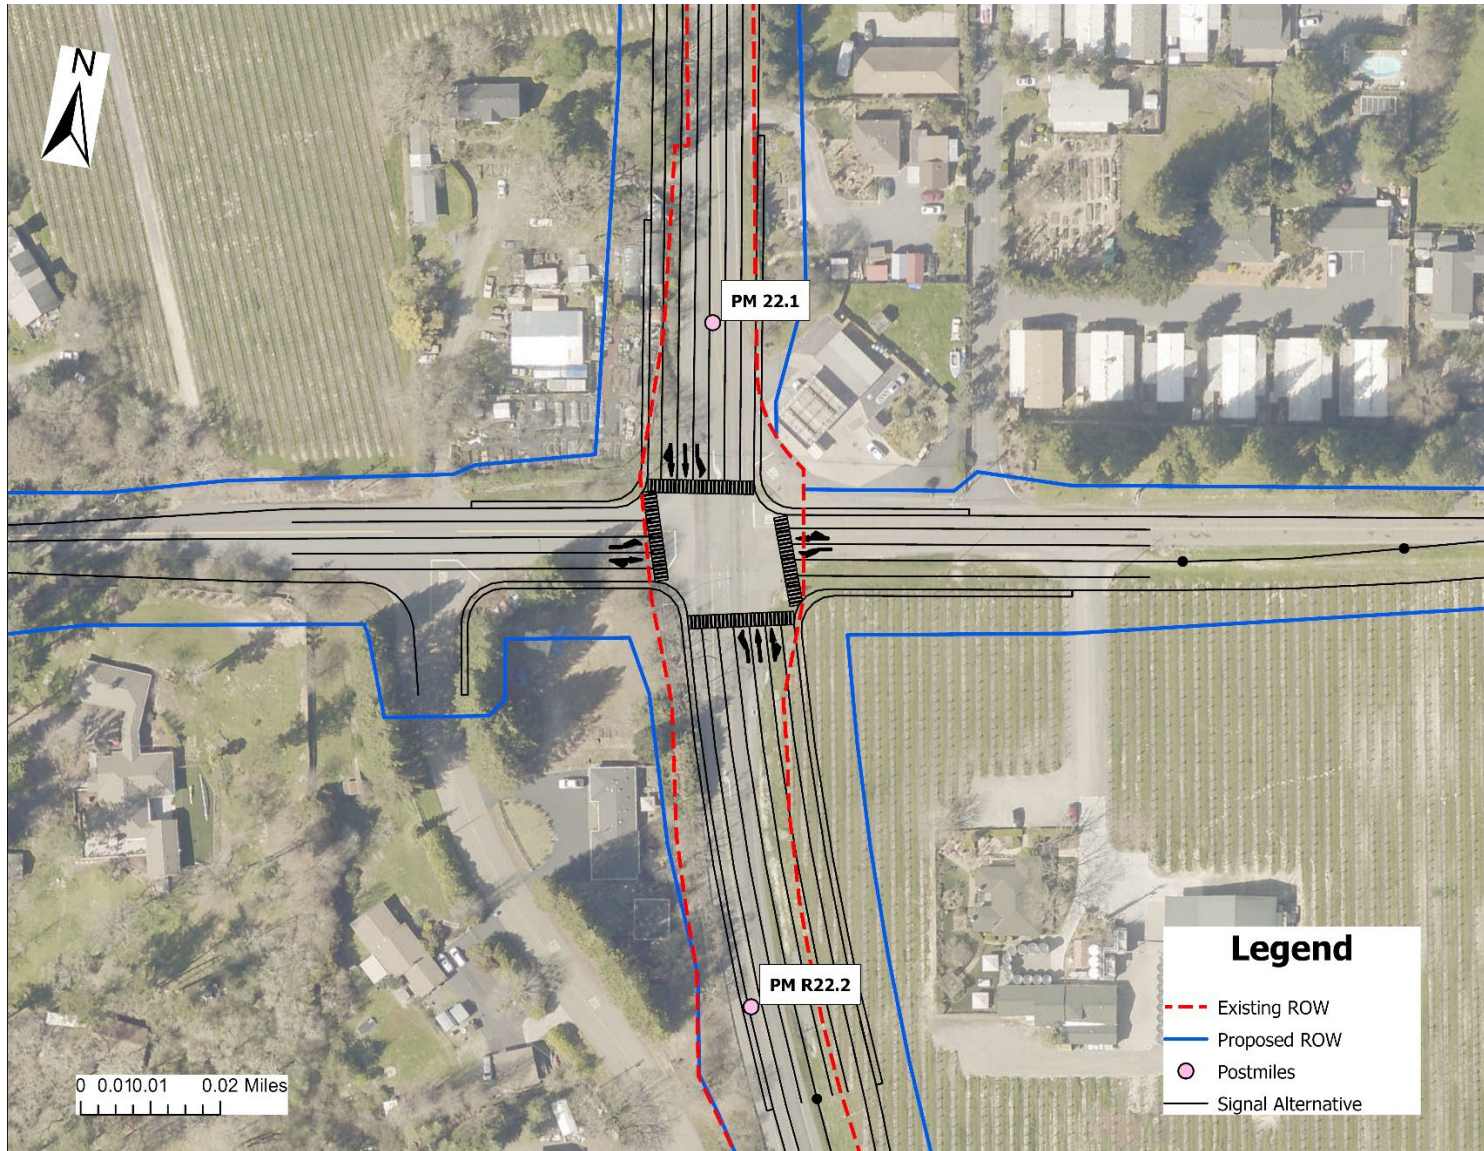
Center view of Alt 1. SR 116 runs north to south, while Green Valley Road runs east to west.
